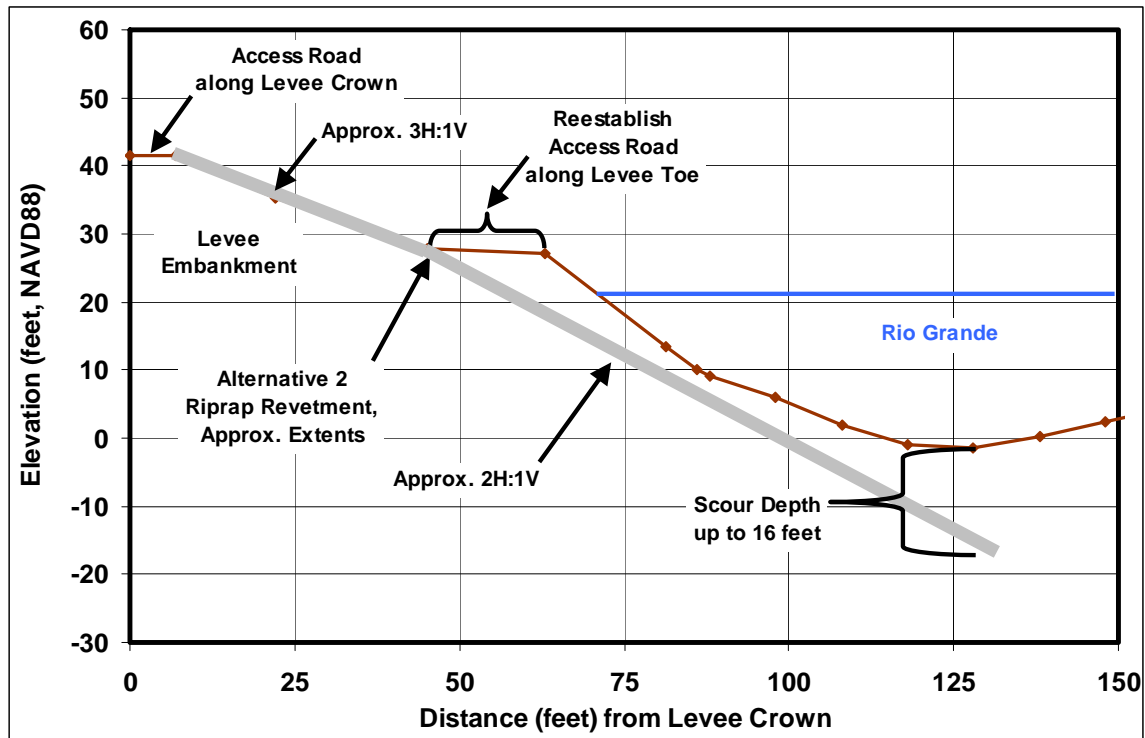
Embankment Protection – Riprap Revetment of Entire Bank (16 feet)
